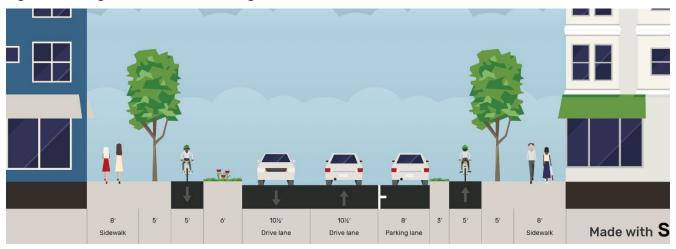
Cameron Street Between 2nd Avenue and Georgia Avenue
